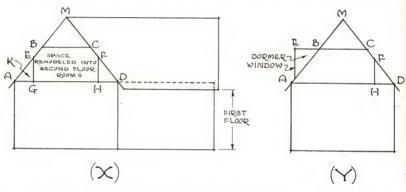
Details of Walls and Ceilings in Attic Room with and without Dormers
